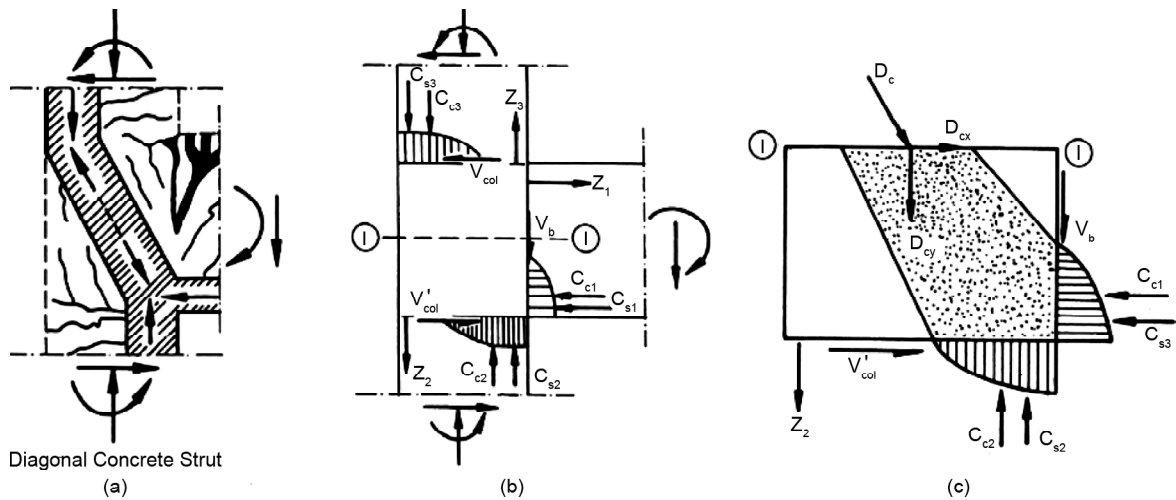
(a) Developed diagonal concrete strut, (b) Internal forces around an exterior beam-column joint, and (c) Forces acting in the joint core concrete through section I-I (Paulay & Park, 1975).
